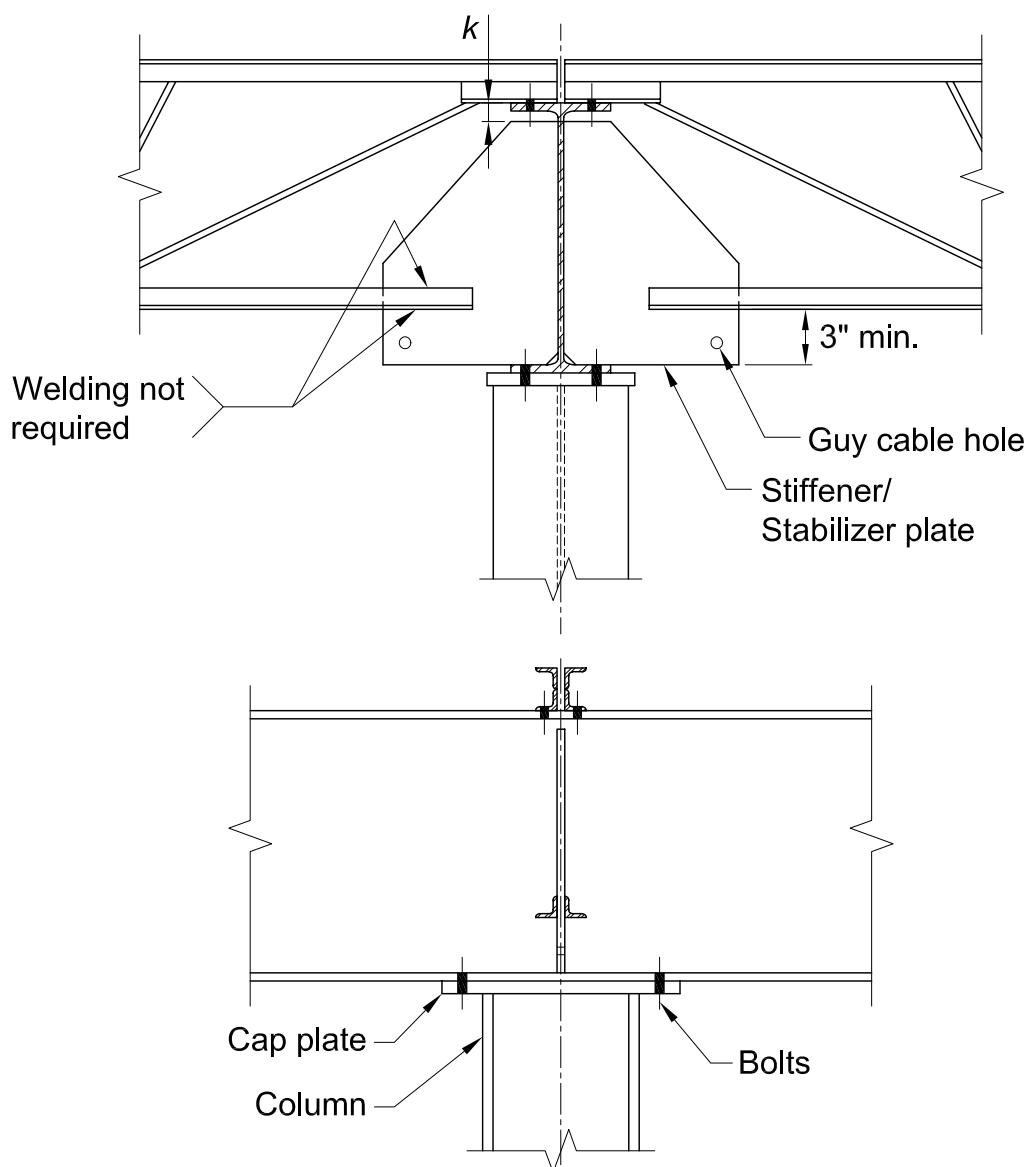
Beam framing continuously over column top, stability provided with stiffener plates, joist-chord extensions located above column top not welded.
